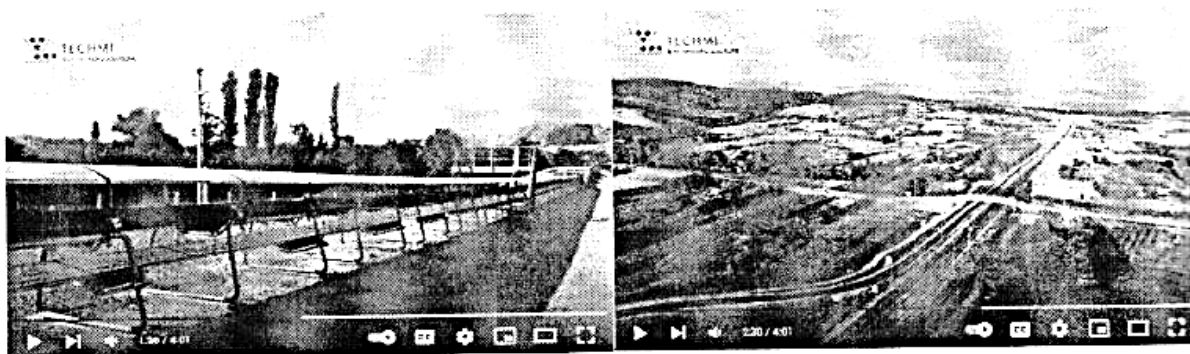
View of the transporter with the service road and the bridge for crossing over the main road
